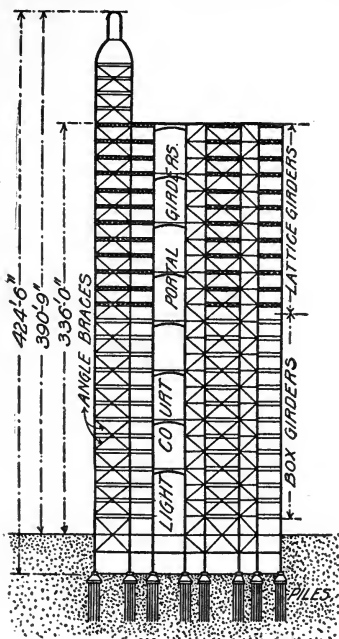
Diagram Elevation of Park Row Building, showing Wind Bracing. high, 24-in. plate girders were used between all outside columns, the connections to the columns being made vertically to the webs of the girders, as shown in Figs. 103 and 126.
